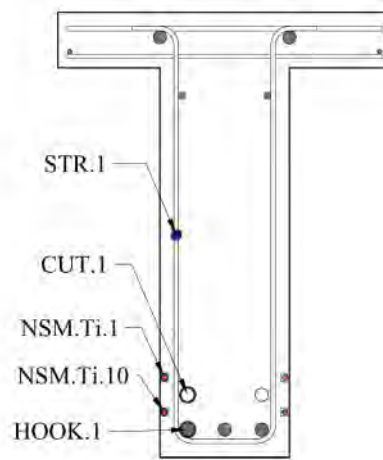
Typical titanium strengthened specimen cross section with labeled internal sensors for T-specimen.
